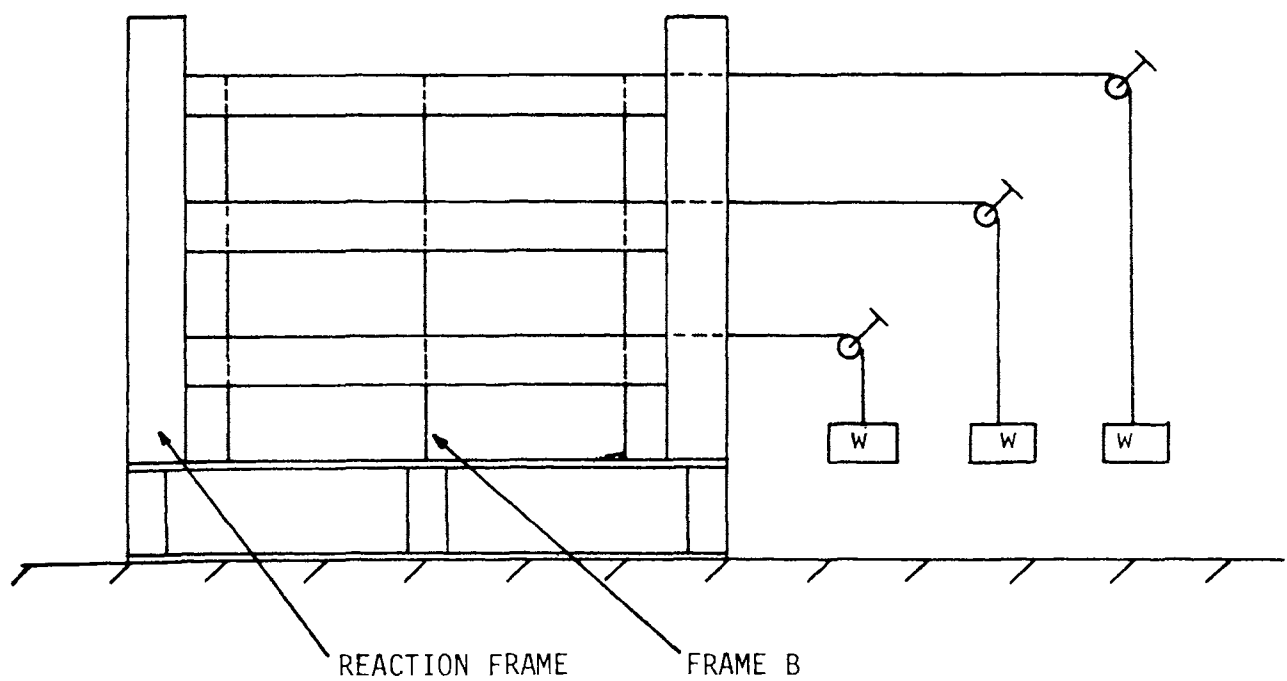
HORIZONTAL LOADING SYSTEM TO BE USED FOR FRAME B
